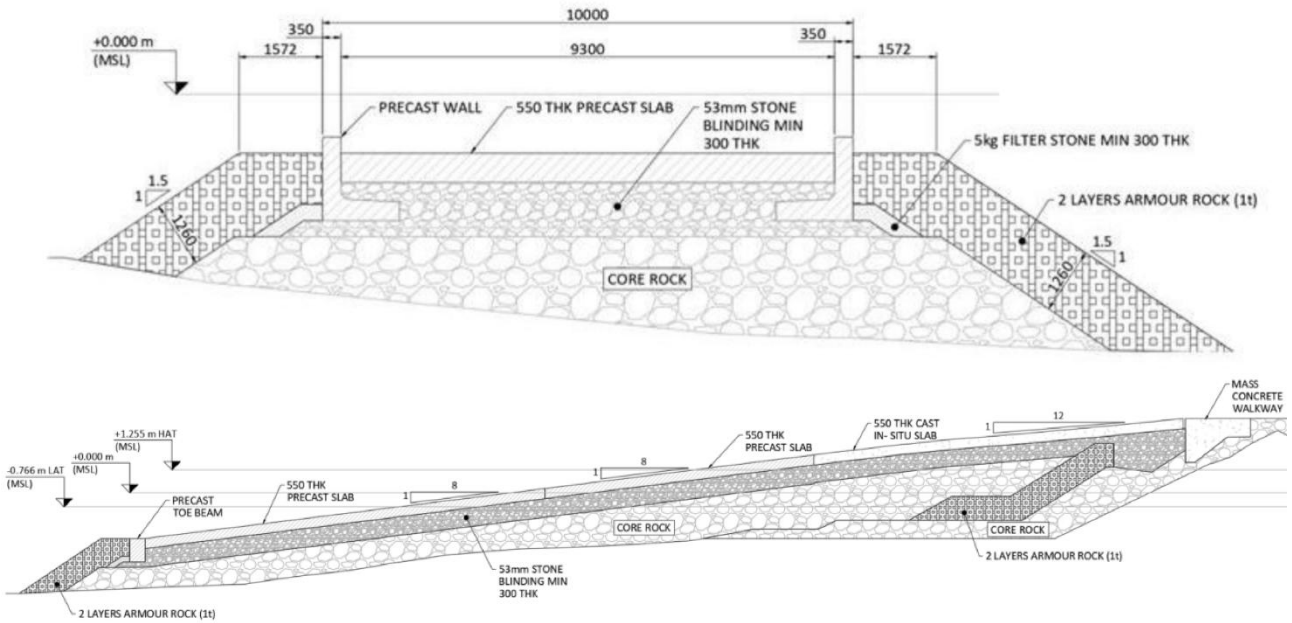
Draft engineering concept sketches of the proposed slipway in cross section (top) and long section (bottom)
